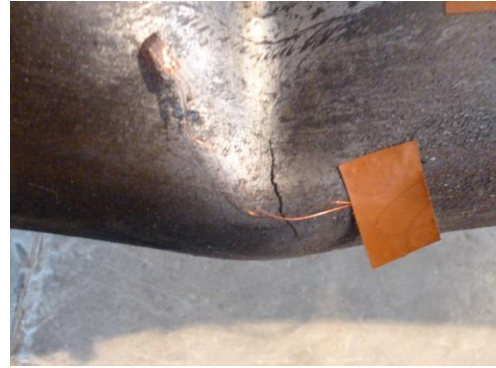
Pipe wall rupture of specimen SP5d due to cyclic bending loading at the dent “ridge”.
